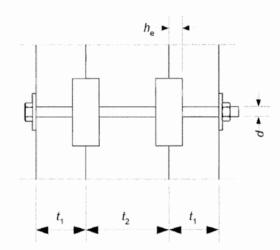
Dimensions for connections with split ring and shear plate connectors
